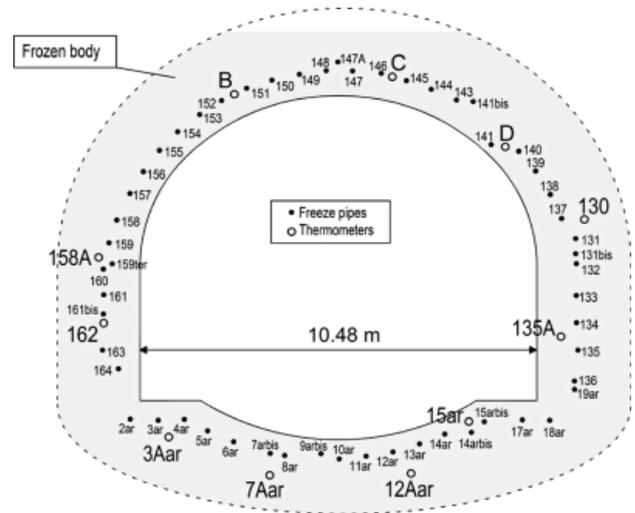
Initial cross section 11 with the installed freeze pipes and the thermometer chains.
